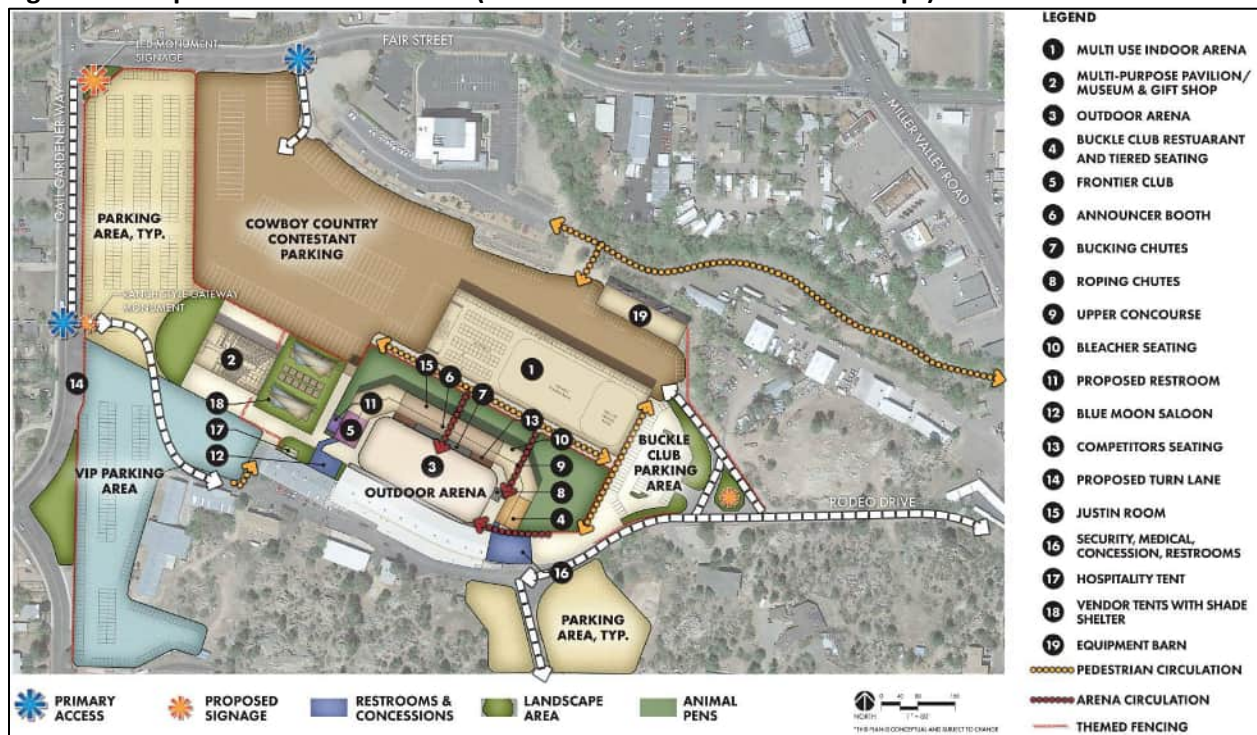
Proposed Master Plan Site Enhancements (December 2022 Master Plan Excerpt):
